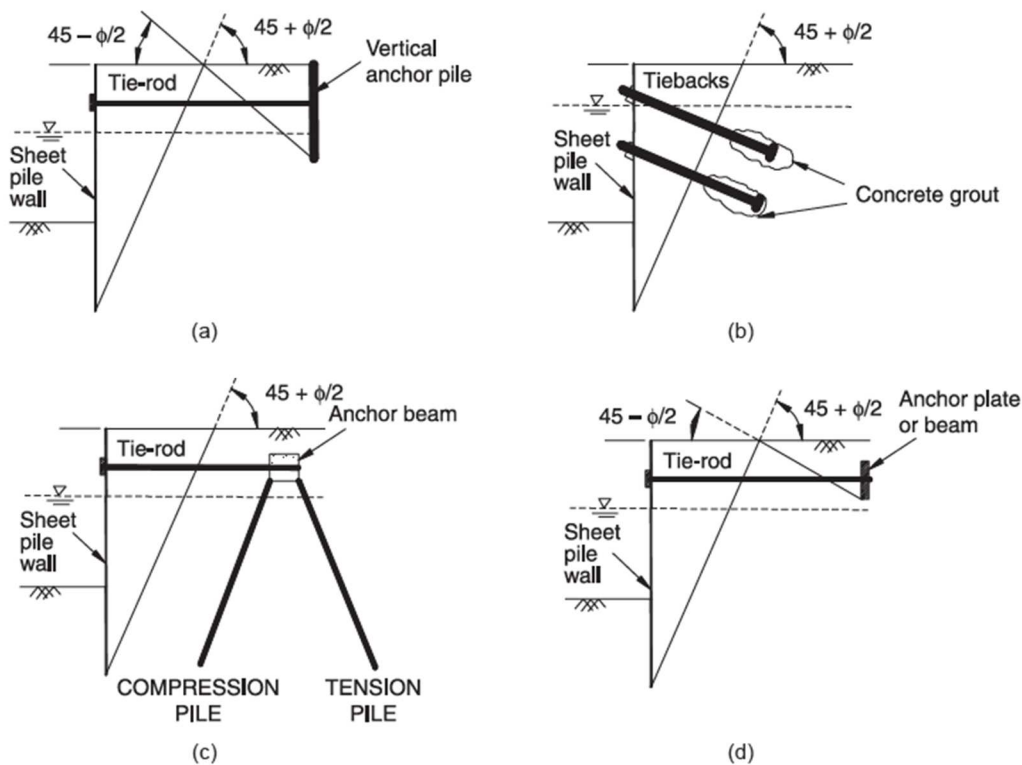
Different types of anchors: (a) vertical anchor pile, (b) tieback, (c) anchor beam, and (d) anchor plate.
